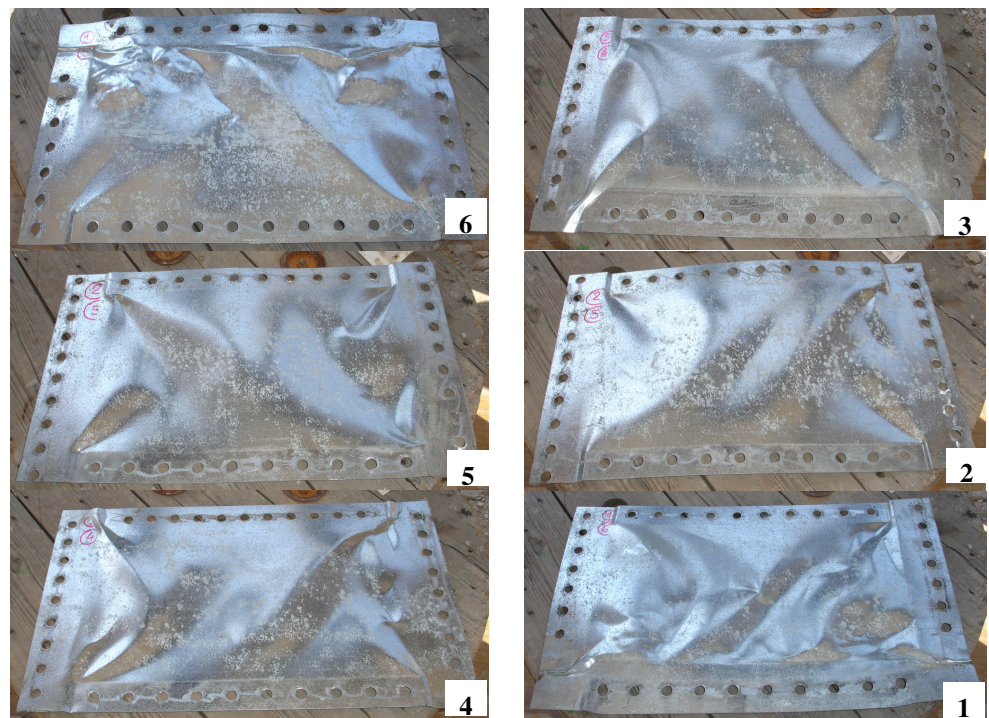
Deformed shapes of sub-panels belonging to the shear wall located at the front side of the RC structure
